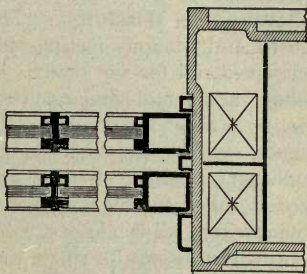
Detail of Sash and Frame, Grand Central Station Building, N. Y.
